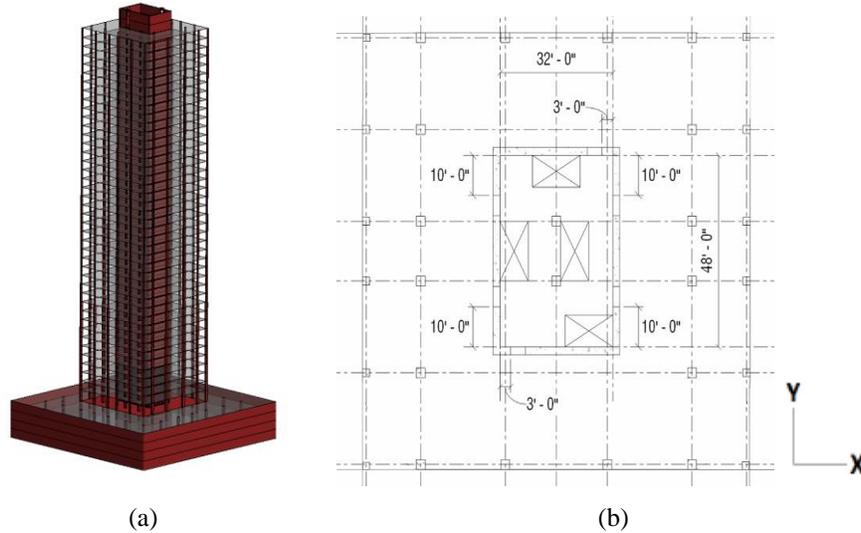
Archetype Reinforced Concrete Shear Wall building: (a) isometric view and (b) plan view. Adapted from [9].
